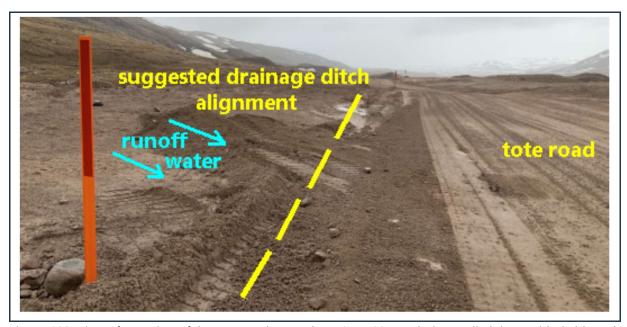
View of a section of the tote road around KM 07+700. No drainage ditch is provided although the ground adjacent to the road is higher than the road level and sloping toward the road.
